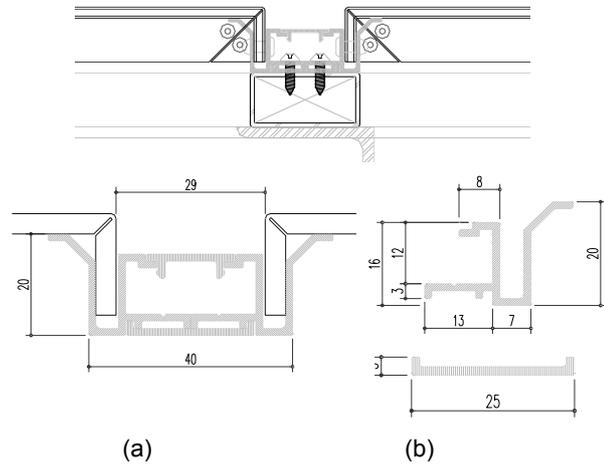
example of detail CAD drawing derivate from IDD method of 3D solid BTS geometry.
